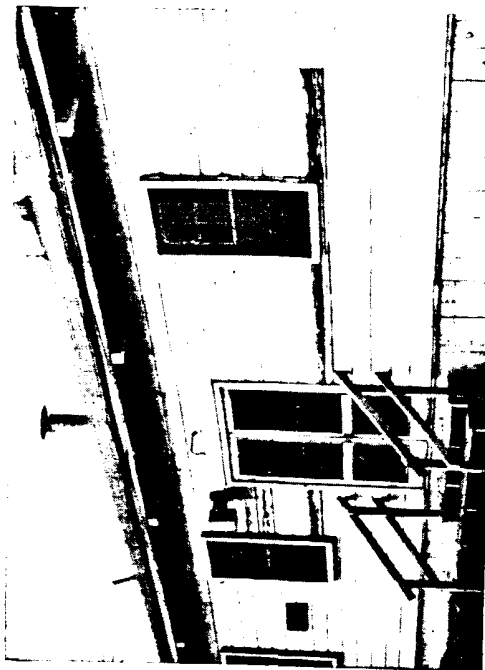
Satisfactory appearance of paint on side of building, except over a few boards of summer wood.
